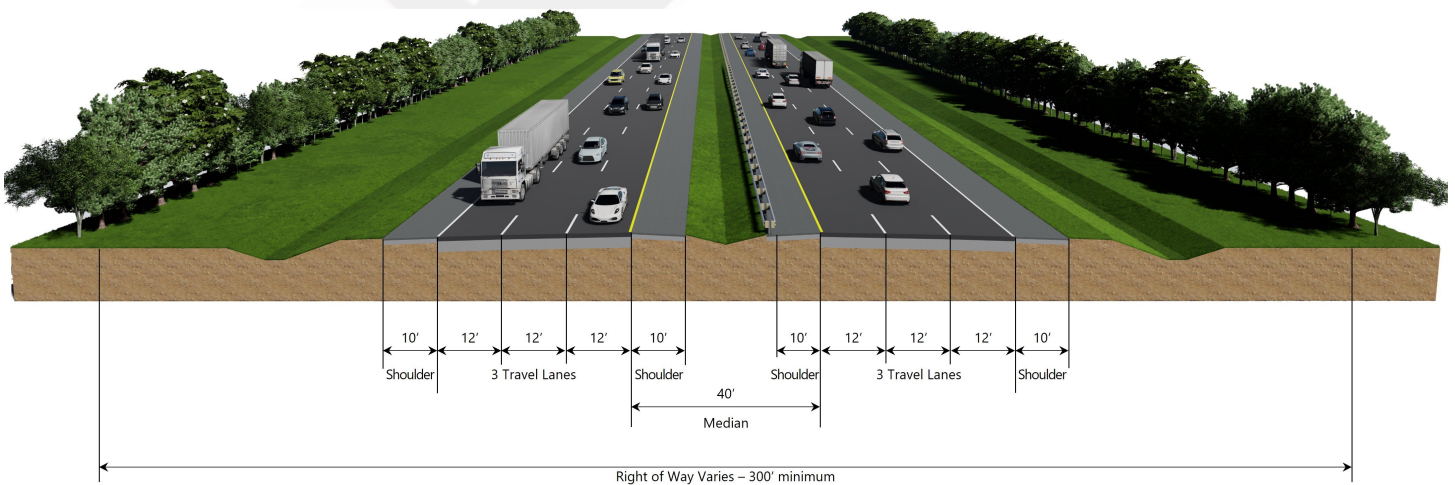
I-95 Existing Typical Section from Southside Boulevard to J. Turner Butler Boulevard (SR 202)
